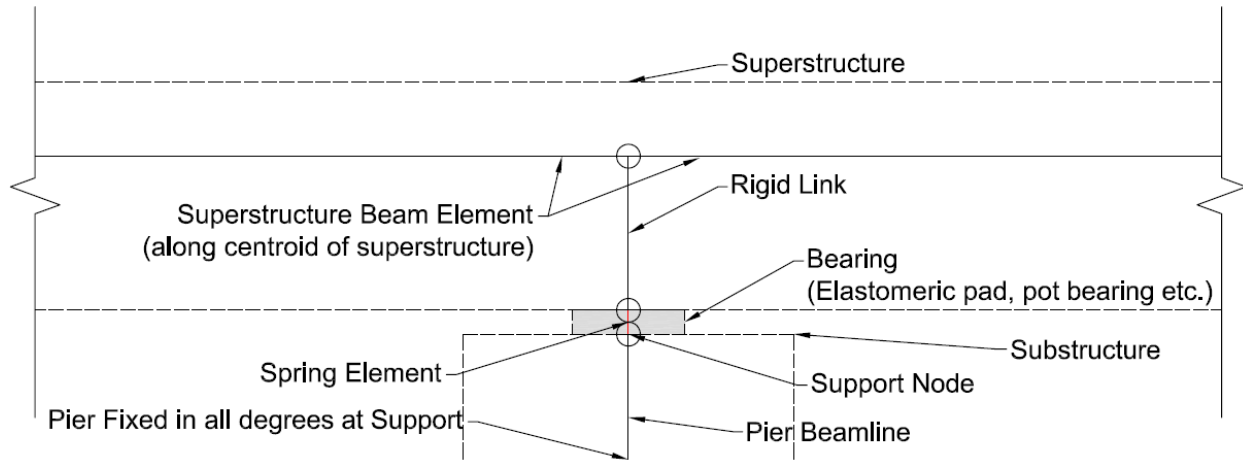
Beam Offset Method for Modeling Support Conditions – Elevation View
